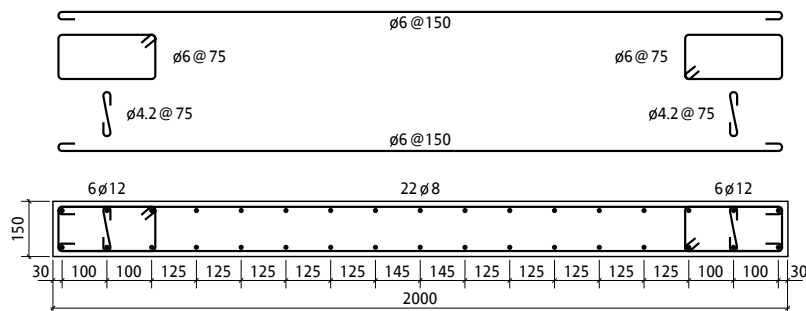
Reinforcement layout for the WSH3 specimen [6]
